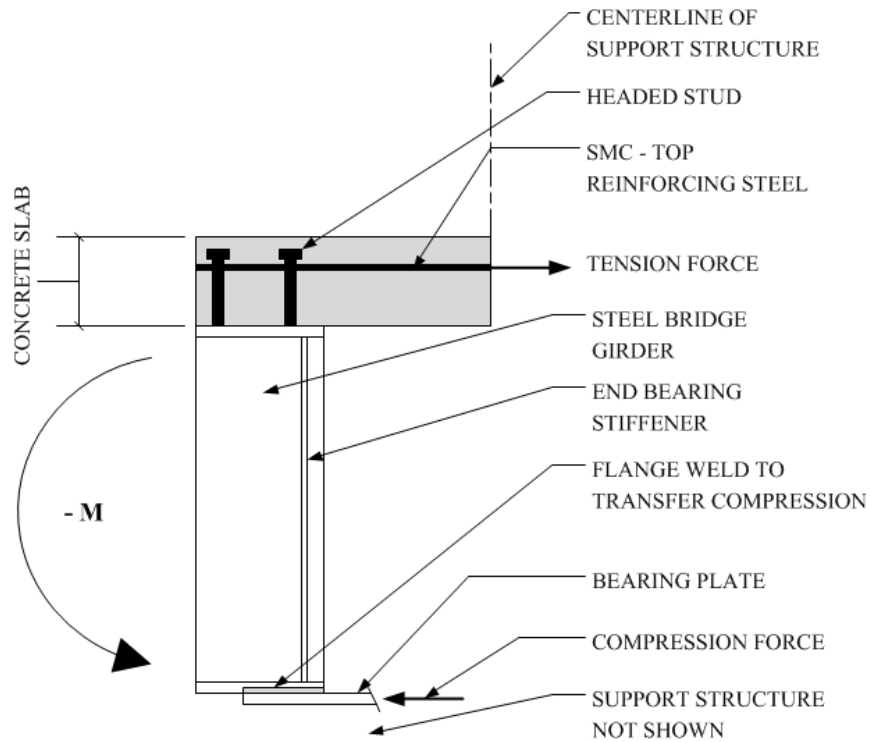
Steel SMC Connection Elements without Concrete Diaphragm
